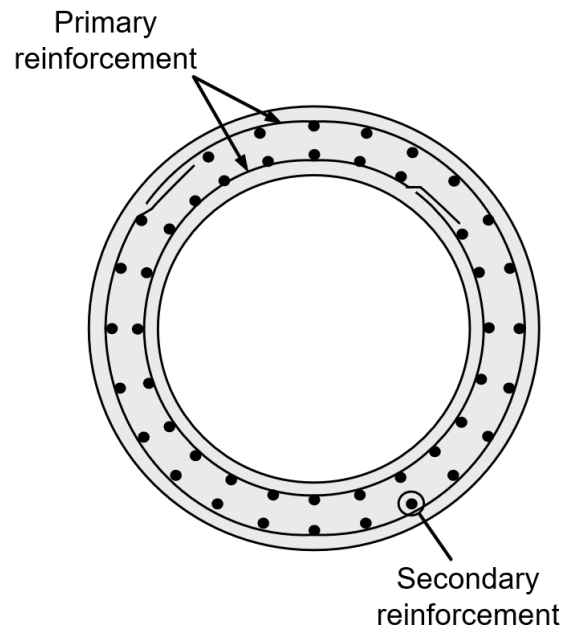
Steel Reinforcement in a Concrete Pipe Culvert
